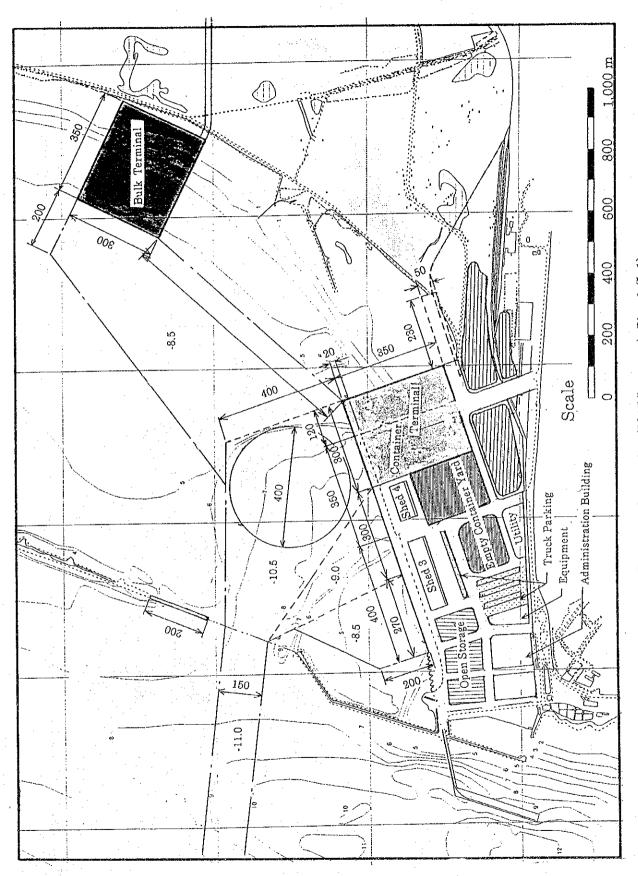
Long-term layout plan (2015, Low case), Plan-1 (L-1)
